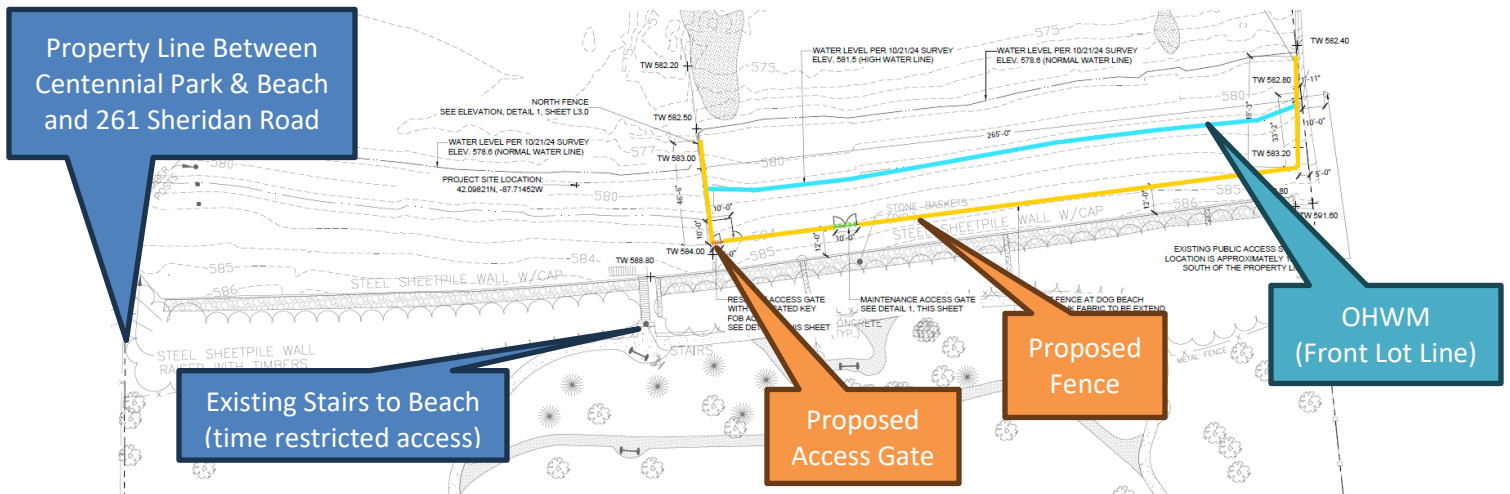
Amended Site Fencing Plan (Excerpt of Sheet L2.0)
